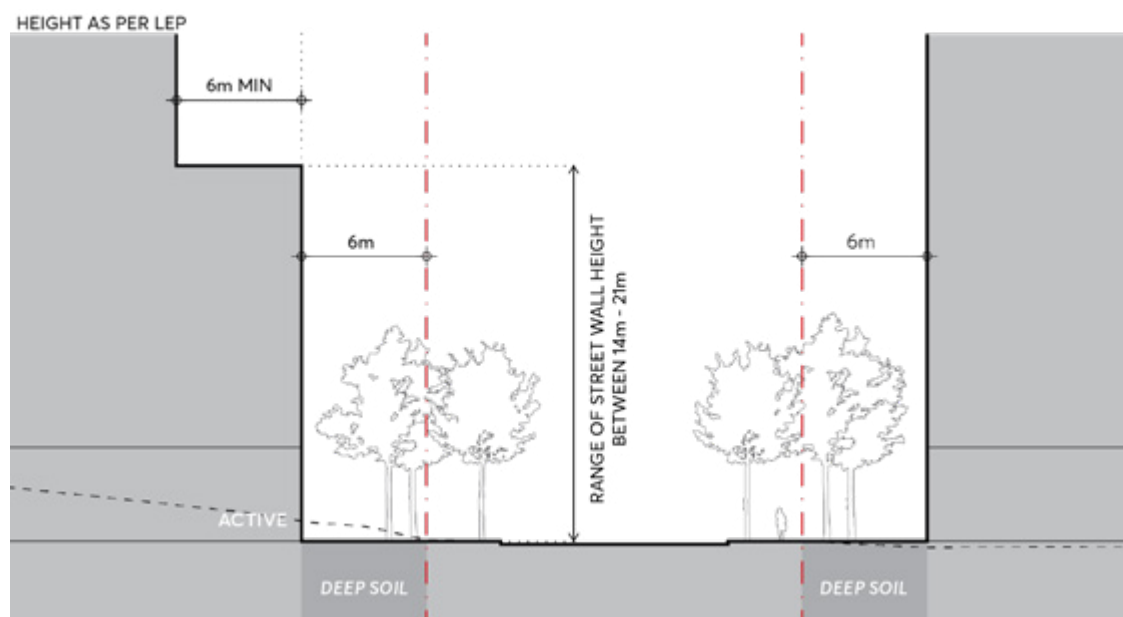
Campbell Street (Section A) Setbacks and Street Wall Height
